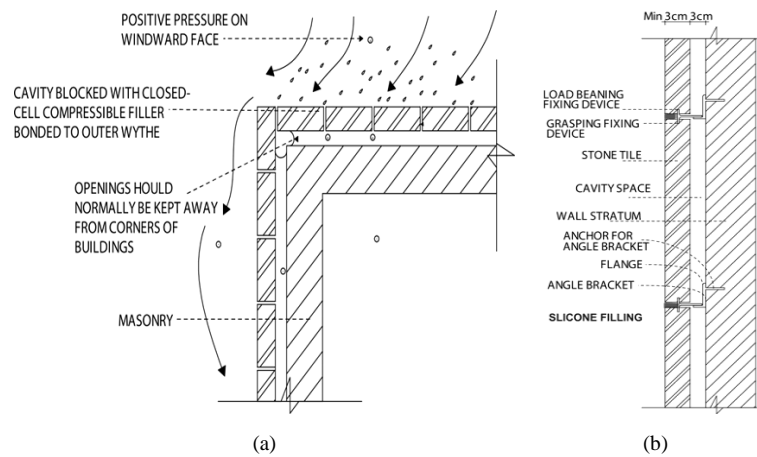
(a) Wall Cladding Water Seal, (b) Wall Cladding Water Seal 2
